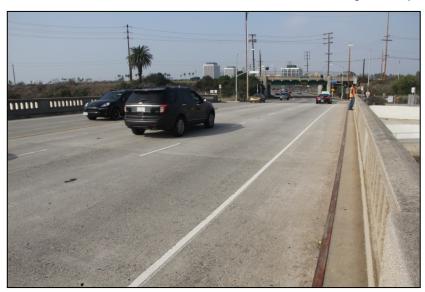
Existing Lincoln Boulevard Bridge over the Ballona Creek
